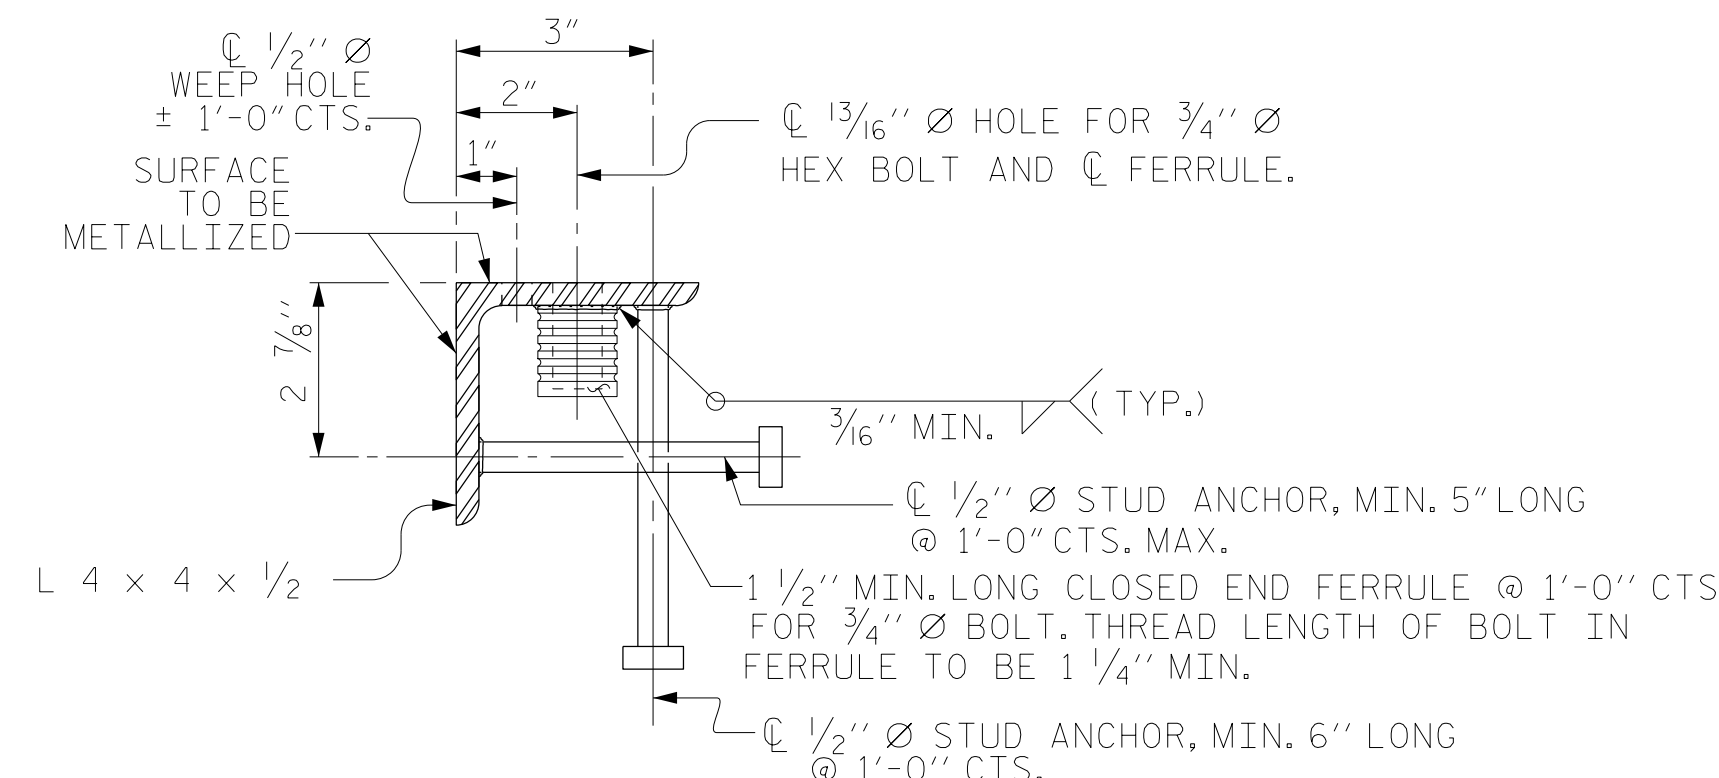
DETAIL - FIELD WELD SPLICE OF BASE ANGLE
